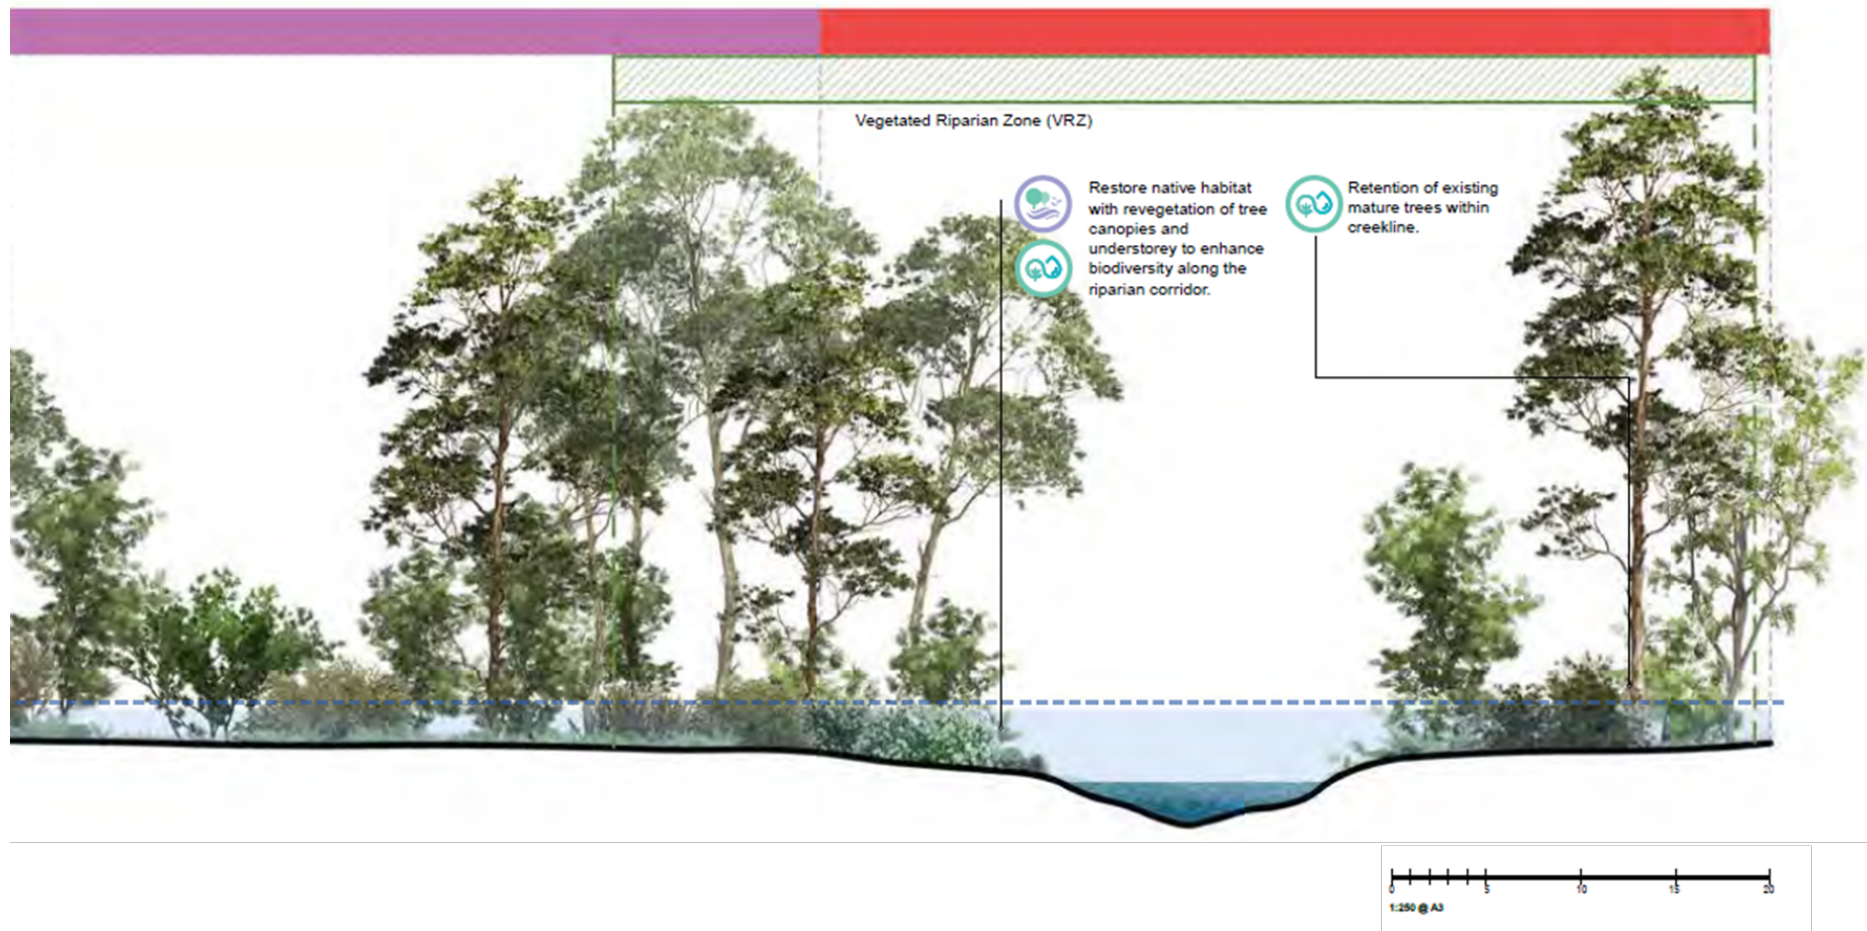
Cross section landscape architect interpretation of MZ2 and MZ1 (Aurecon ARUP 2021)
